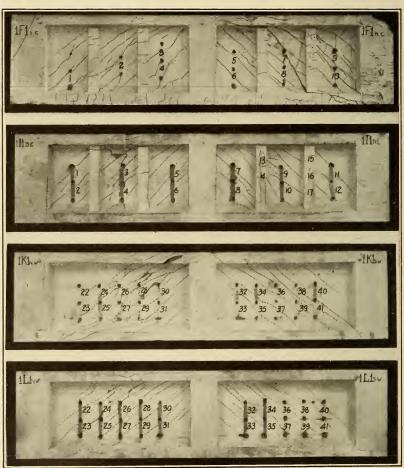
Failure of 52-inch beams 1F1, 1I1, 1K1, and 1L1, showing location of gauge lines used in Figure 54
